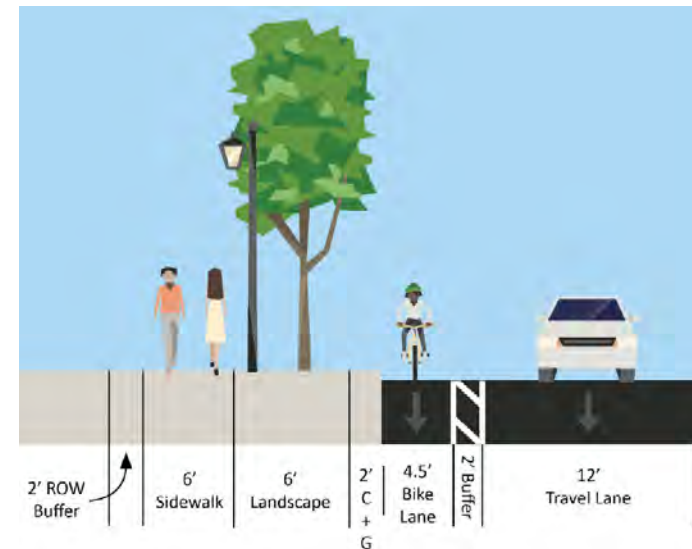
ORO DAM BOULEVARD BIKE LANE RECOMMENDATION
